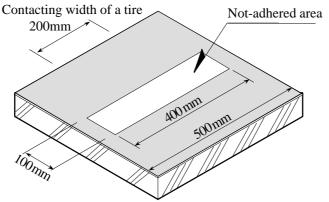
Area not adhered to concrete substrate in sample 3 and 4
